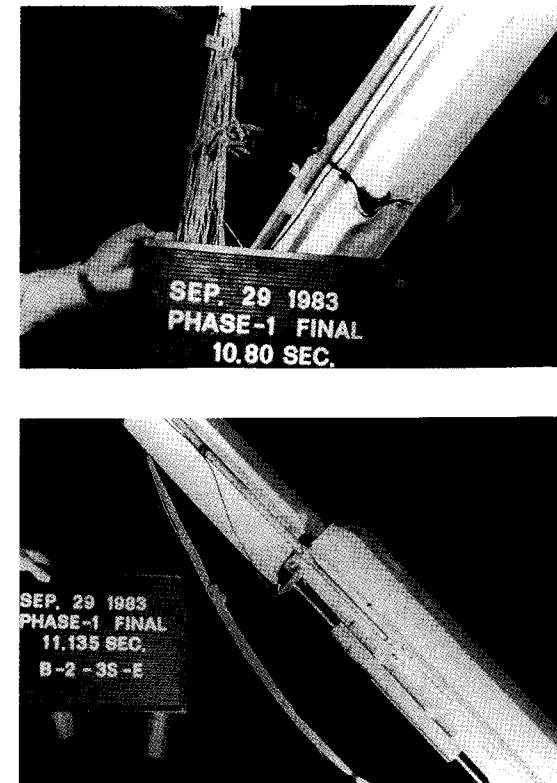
Fracture of concentric brace in US-Japan test structure.
